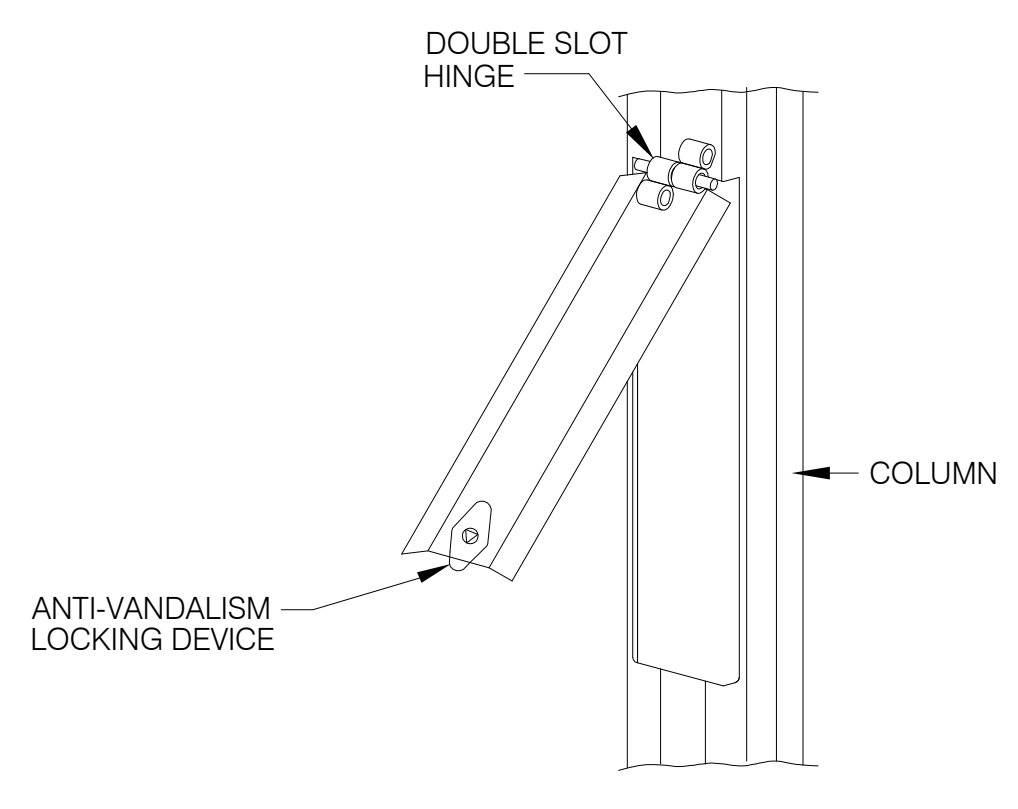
DOUBLE SLOT HINGED FIBRE SERVICE DOOR
